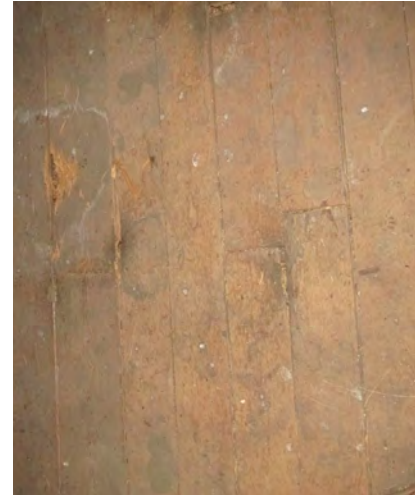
Wood strip flooring in hayloft. (HA, 2015)
